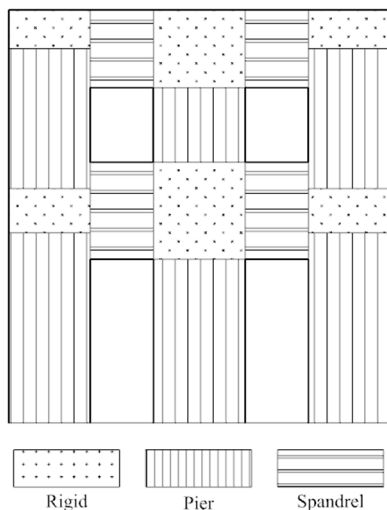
Visualization of division of rigid, piers and spandrels of a wall section.
